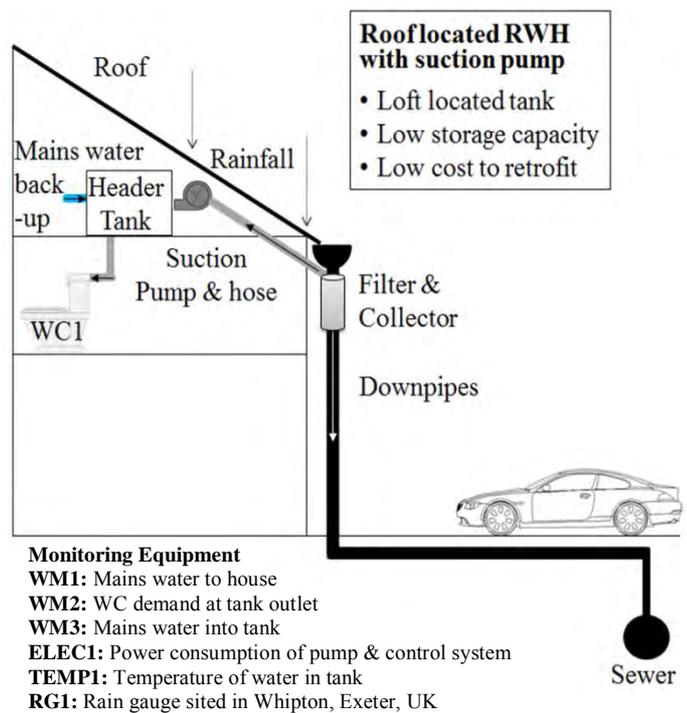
FlushRain configuration and monitoring equipment installed at the trial site
